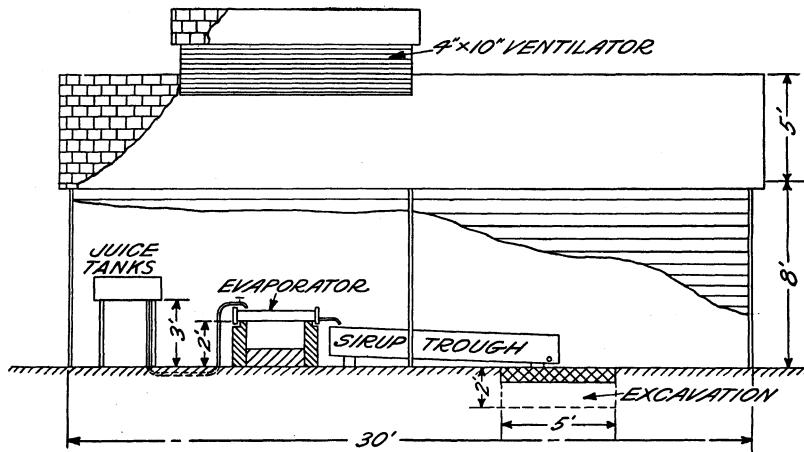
Sectional side elevation of pan house when on level ground.
